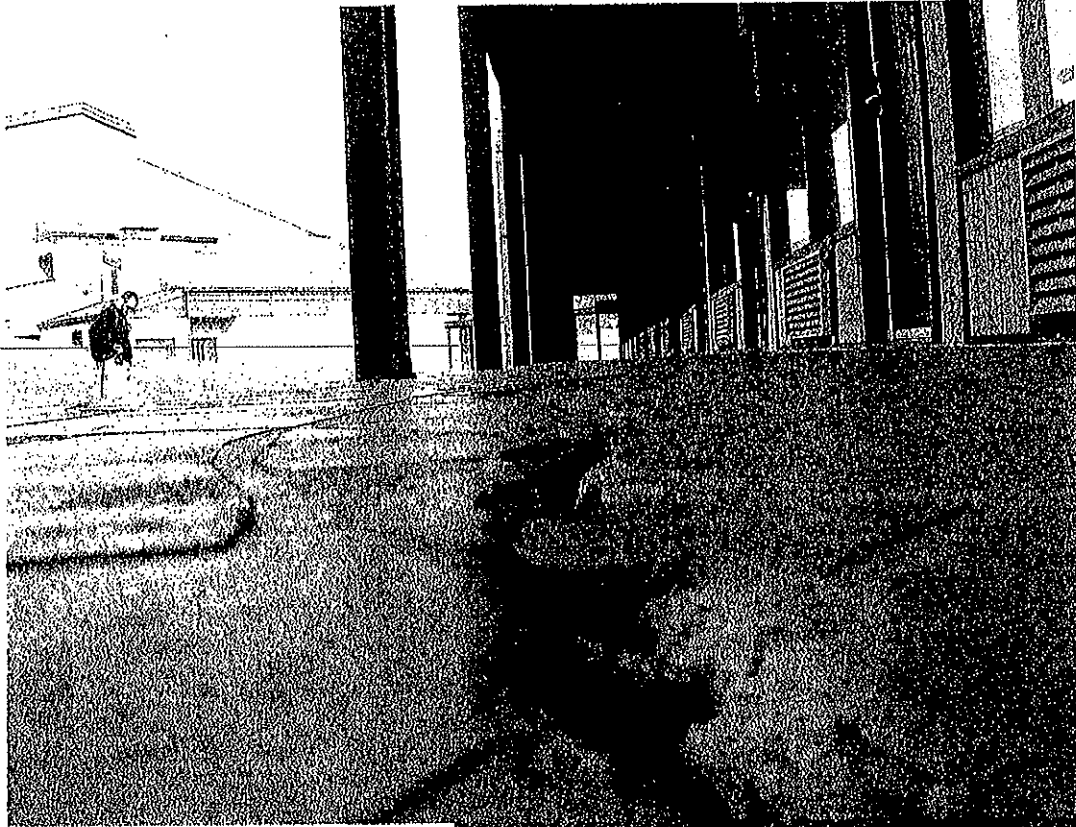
Photo Shows Vertical Misalignment of Slab Sections
